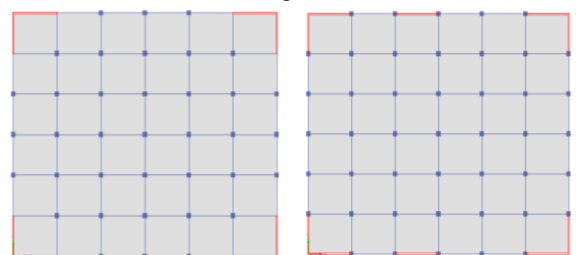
Plan of Step Back Set Back Structure with shear wall 1(left) and shear wall 2(right)
